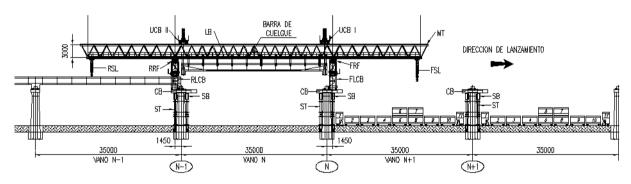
Launching Girder - Precast Segmental Box Girder Construction
